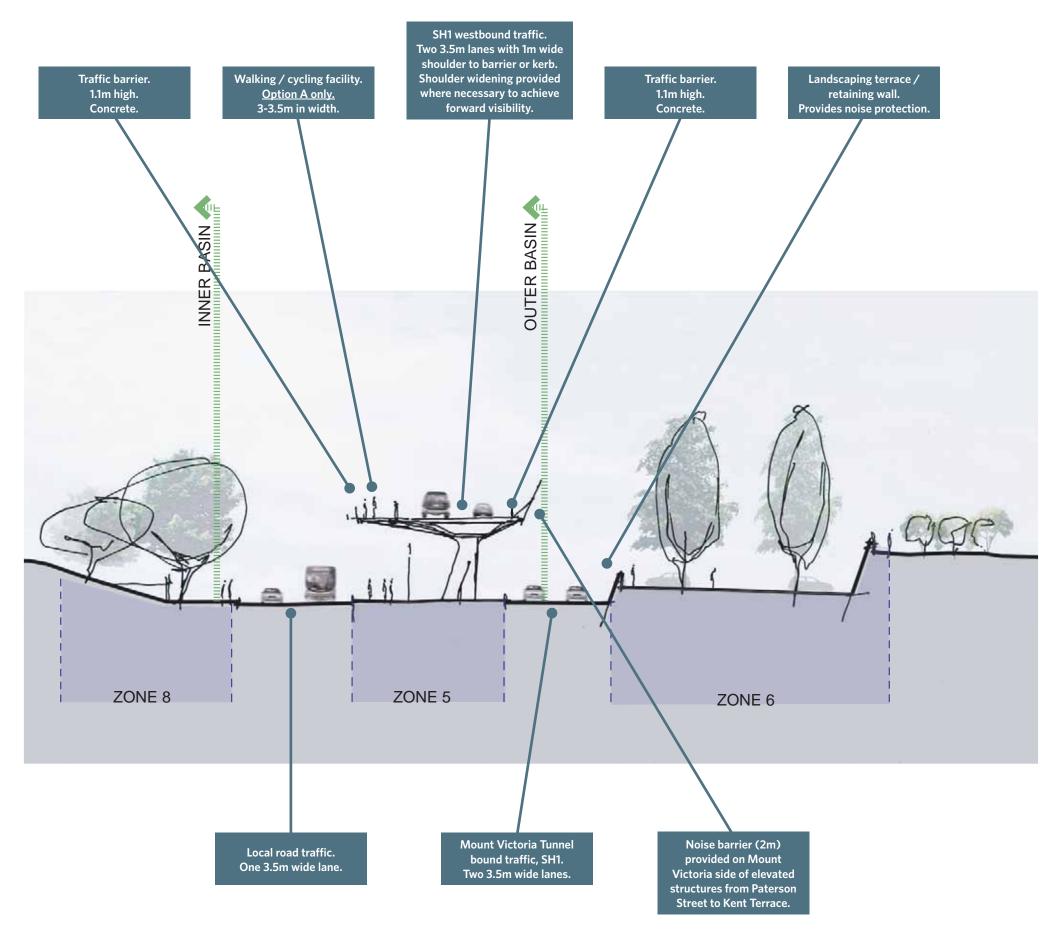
Option B Cross Section (Note: the sketches are preliminary concepts only and subject to change)
